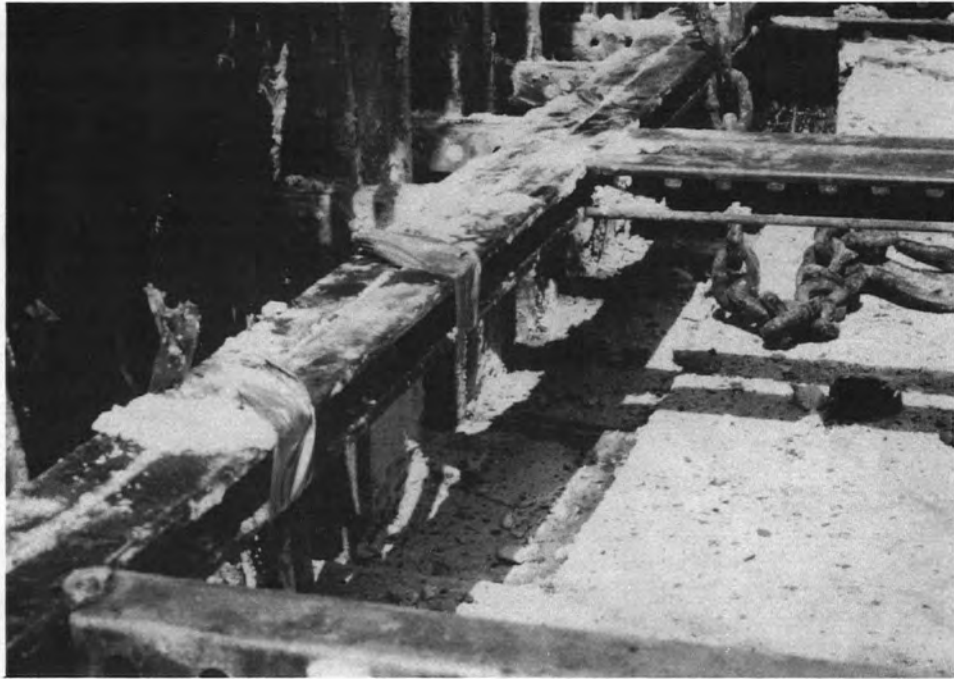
UNEXPOSED SIDE AFTER TEST
